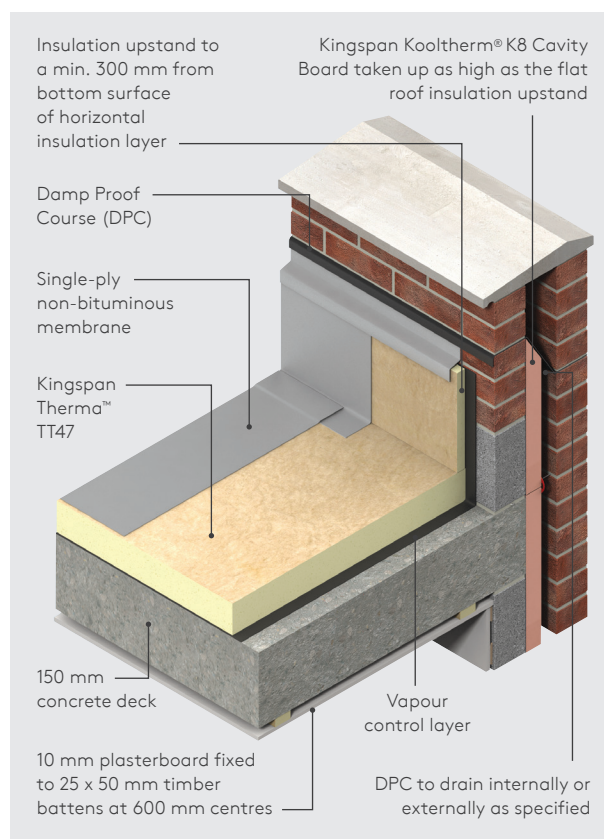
Kingspan Therma™ TT47 in a Dense Concrete Deck with Suspended Ceiling.
